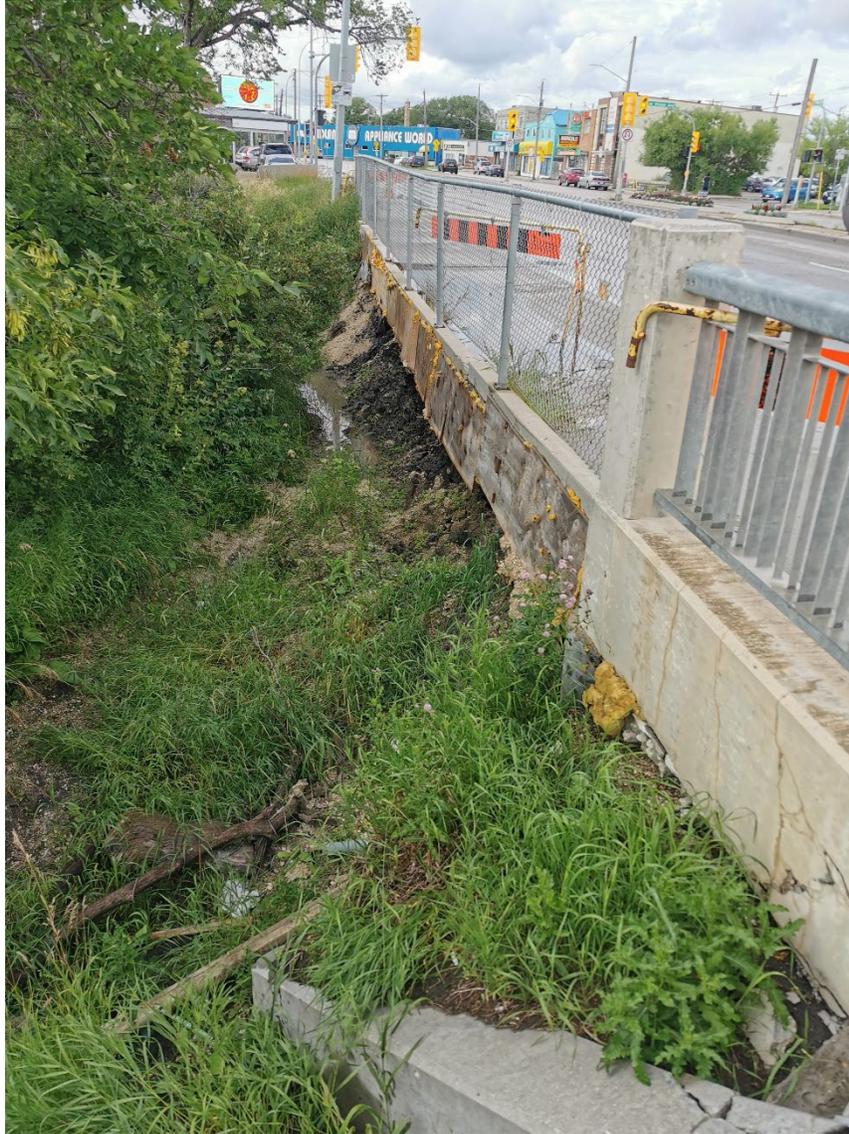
Undermined section of sidewalk after rain on July 27, 2022
